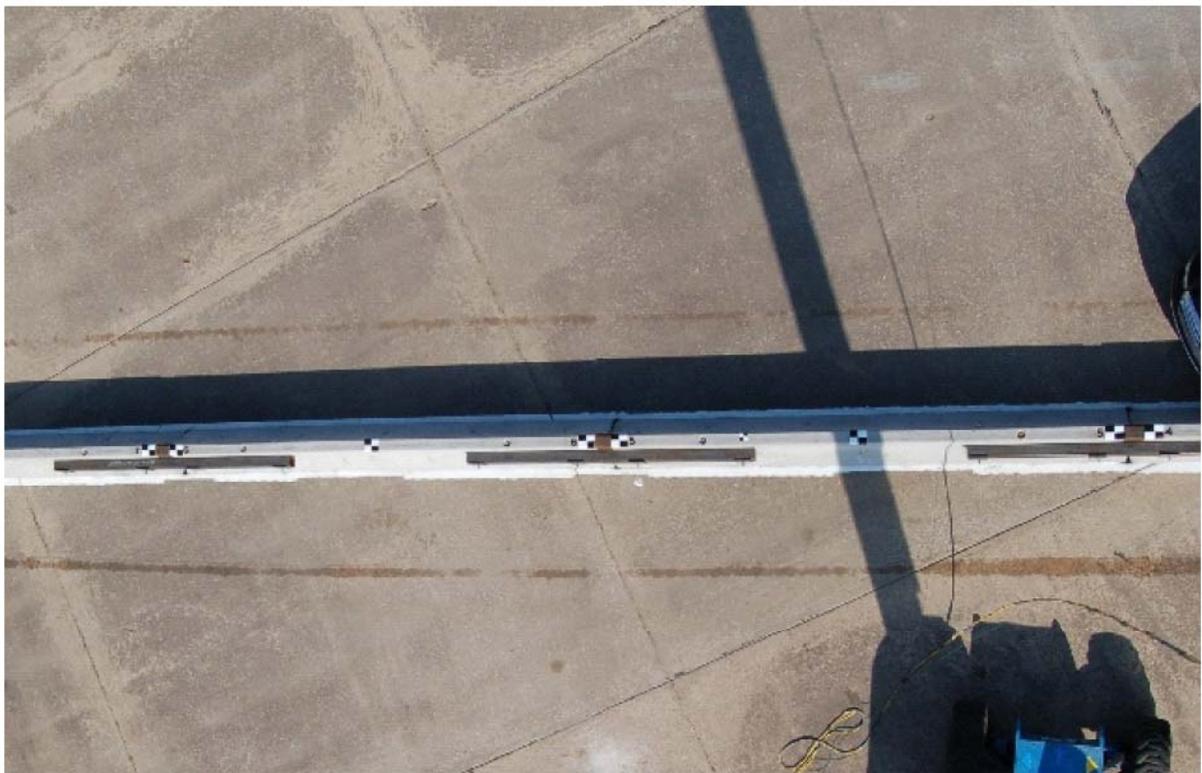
Box Beam Stiffeners, Test NYTCB-1
